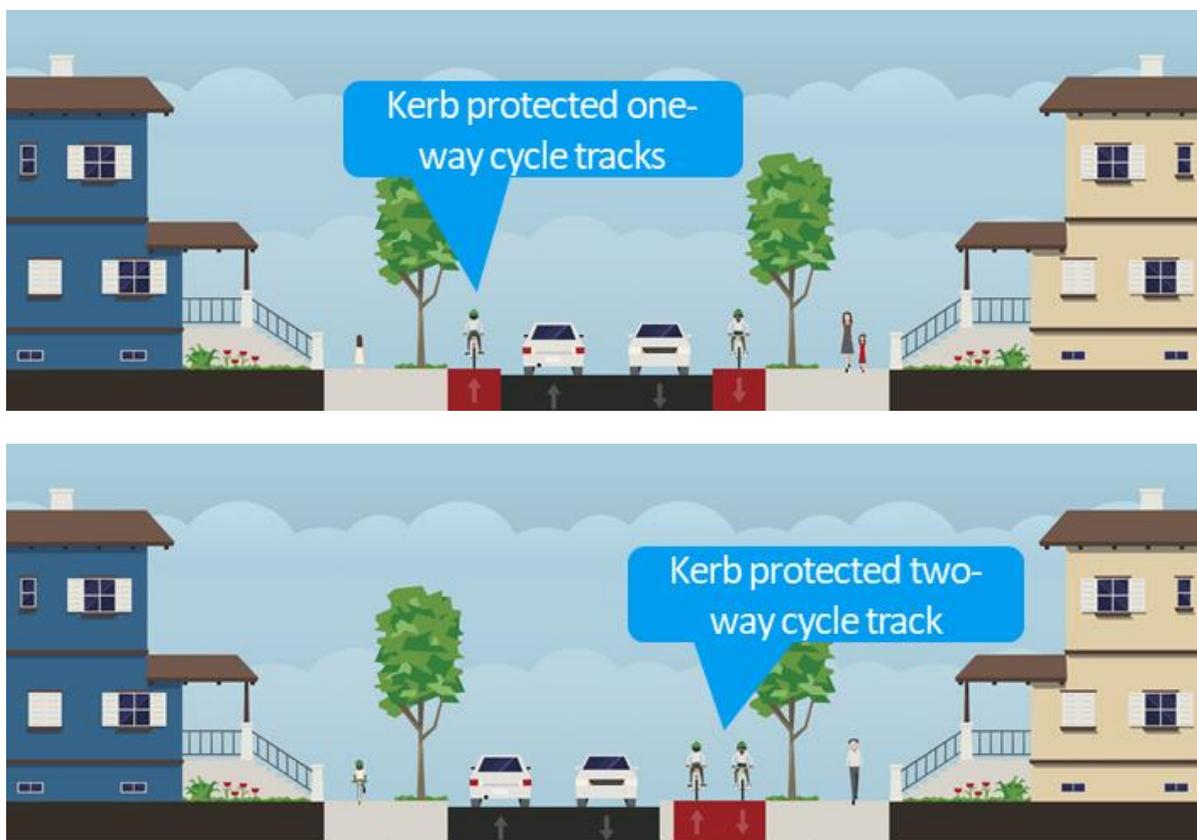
Typical one-way and two-way cross section between junctions (images: Streetmix)
